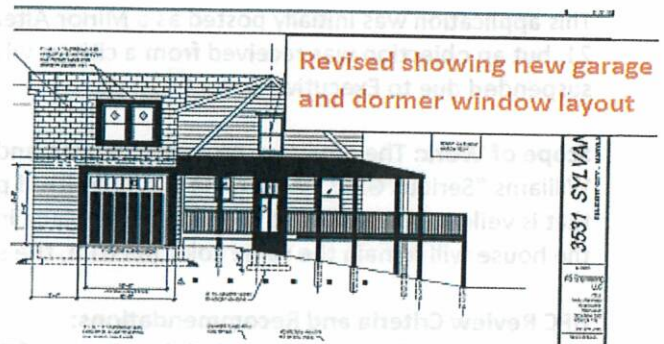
Current submission incorrectly shows roofing shingles instead of siding.
